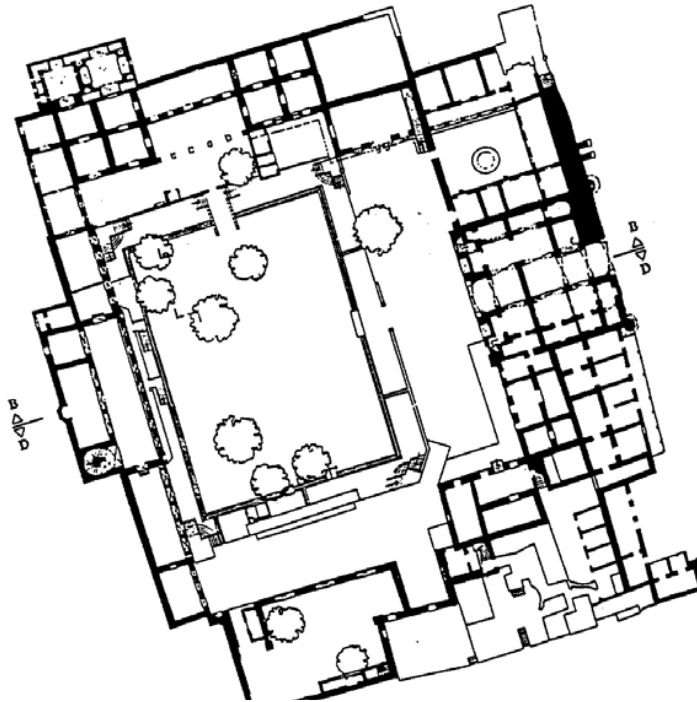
Ground Floor Plan of the Haveli Khush Hal Singh (Source: AKCSP)
